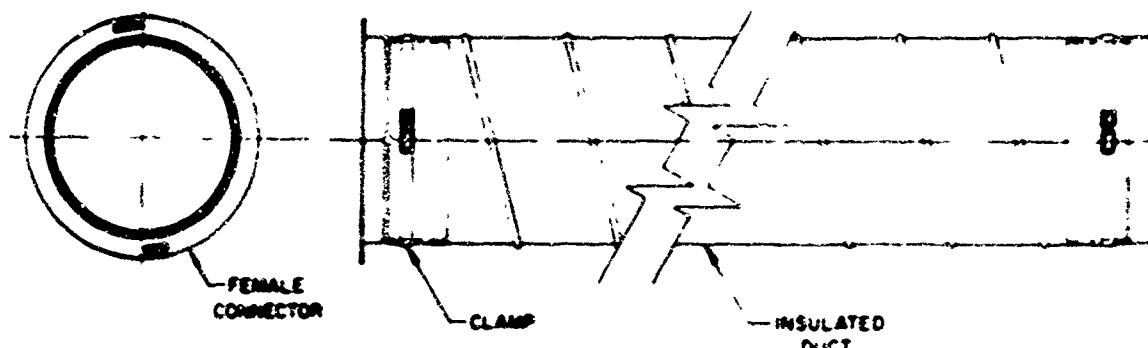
Drawing Showing Cam-lock Arrangement for Connecting Flexible Duct to Plenum
